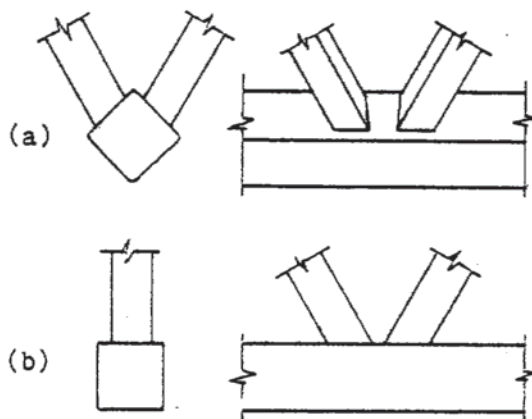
Planar and Triangular Truss Tension Chord Joints.
